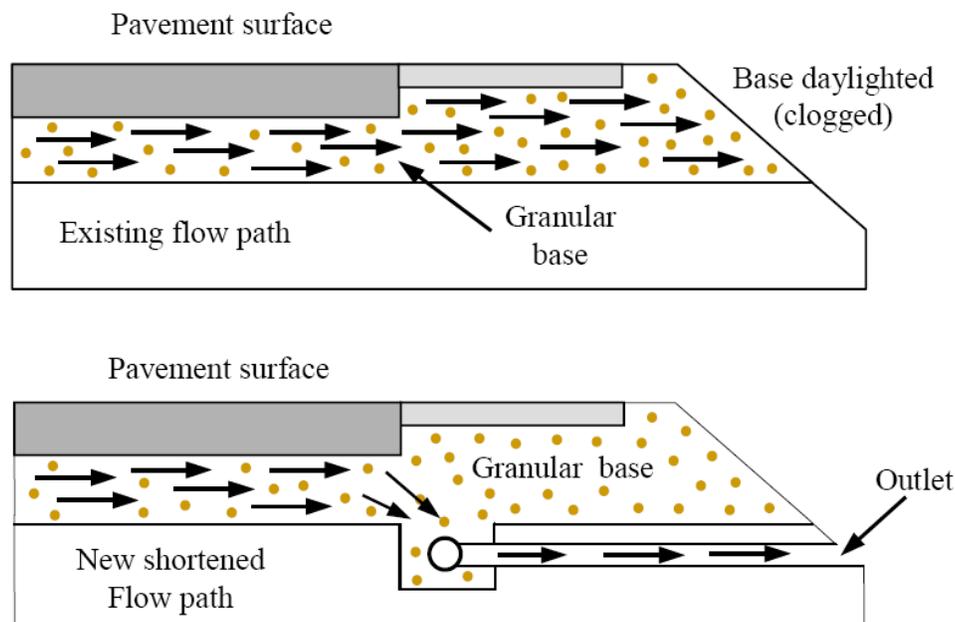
Drains work by shortening the drainage path and eliminating the need for water to flow through potentially clogged base material (Smith et al. 2008).
